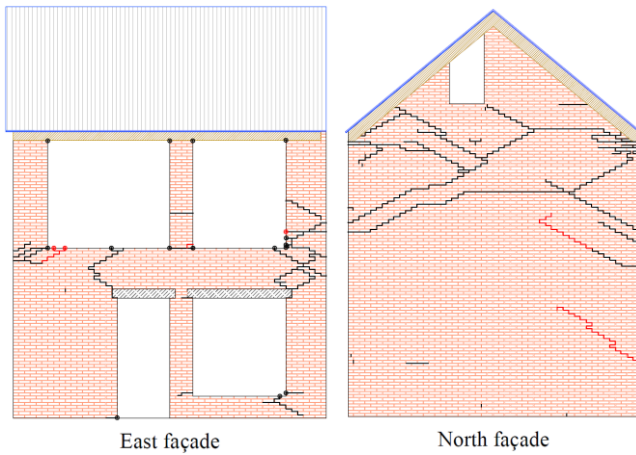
Bare building at ultimate conditions: longitudinal clay outer leaves.
